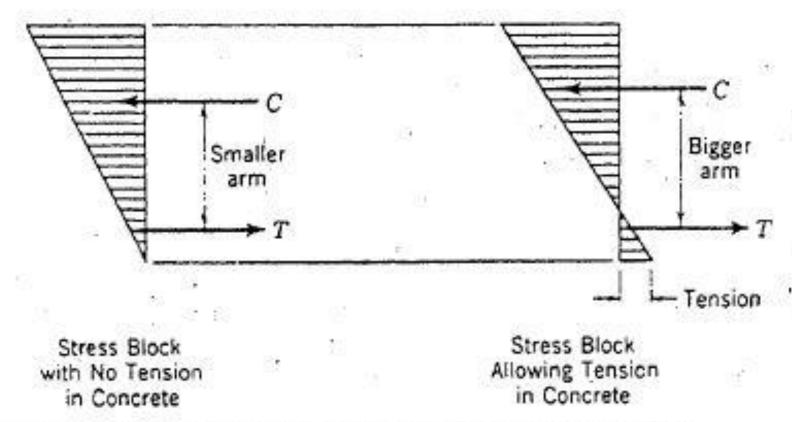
Bigger arm for steel when allowing tension in concrete.
